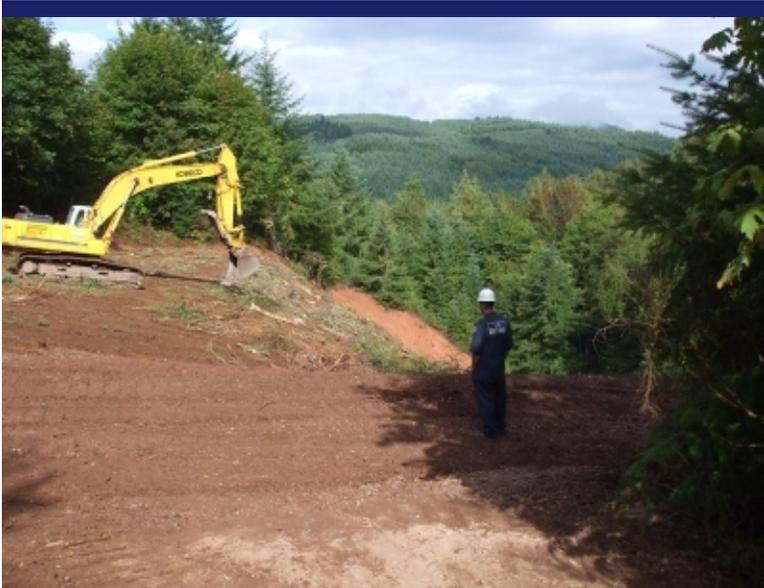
Main Tailing Pile - West slope showing soil cap with woody debris on surface .
